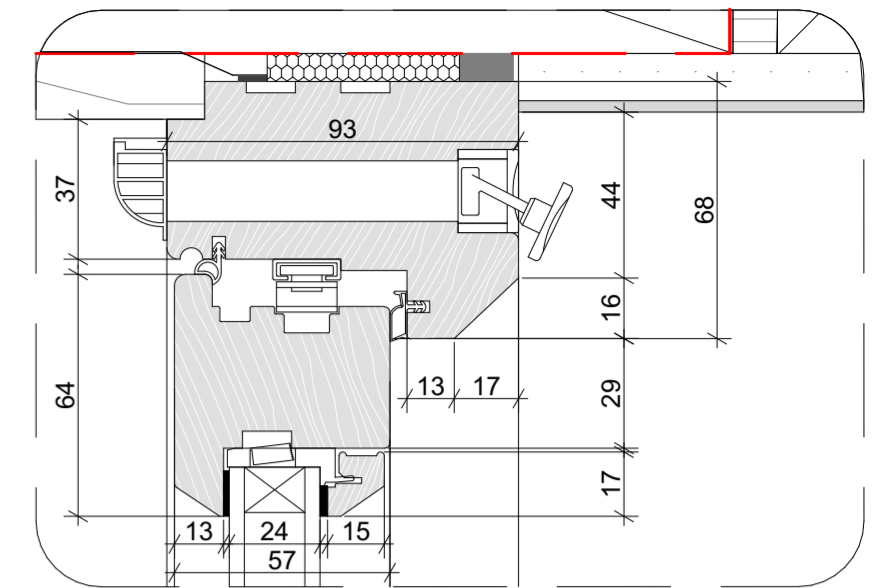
GFW 01, 02 and 03 Elevation 1:10
